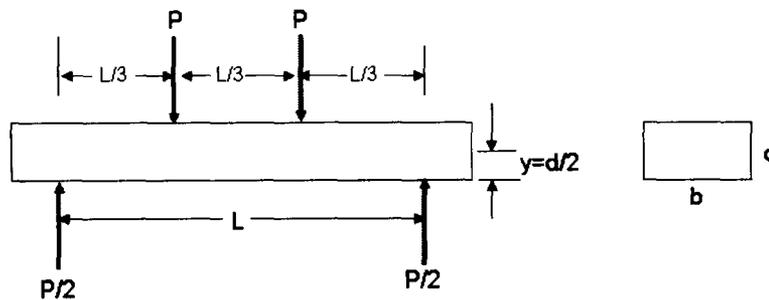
Four point bending test specimen, a) side view; b) end view.
